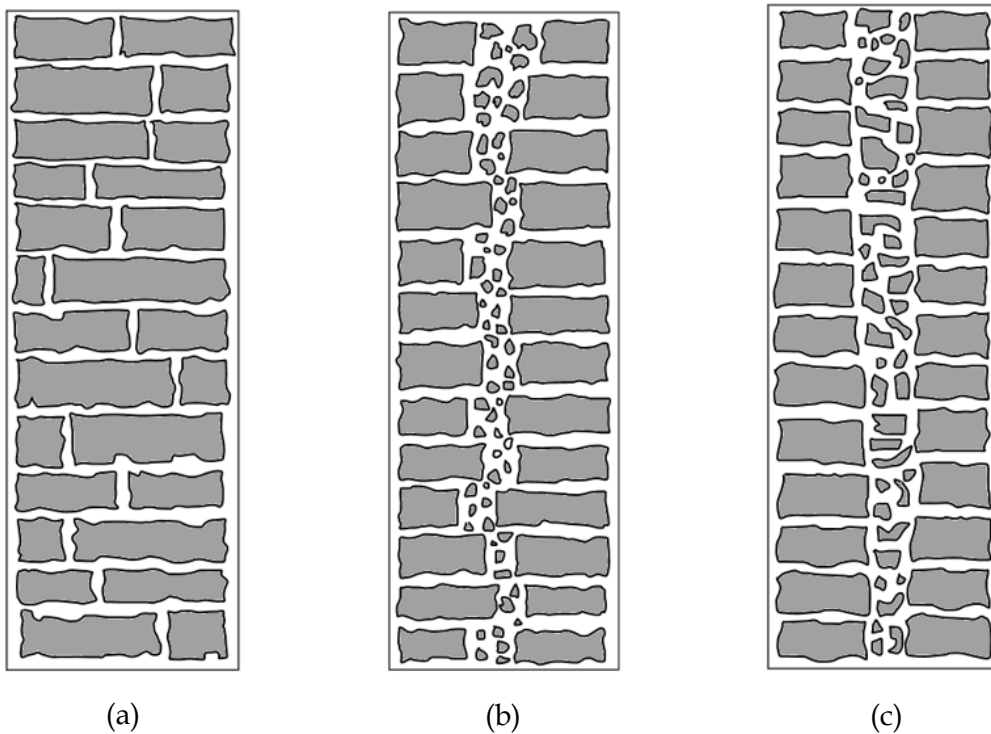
Leaf settings of the masonry walls: (a) single leaf masonry wall, (b) two leaves masonry wall and (c) three leaves masonry wall.
